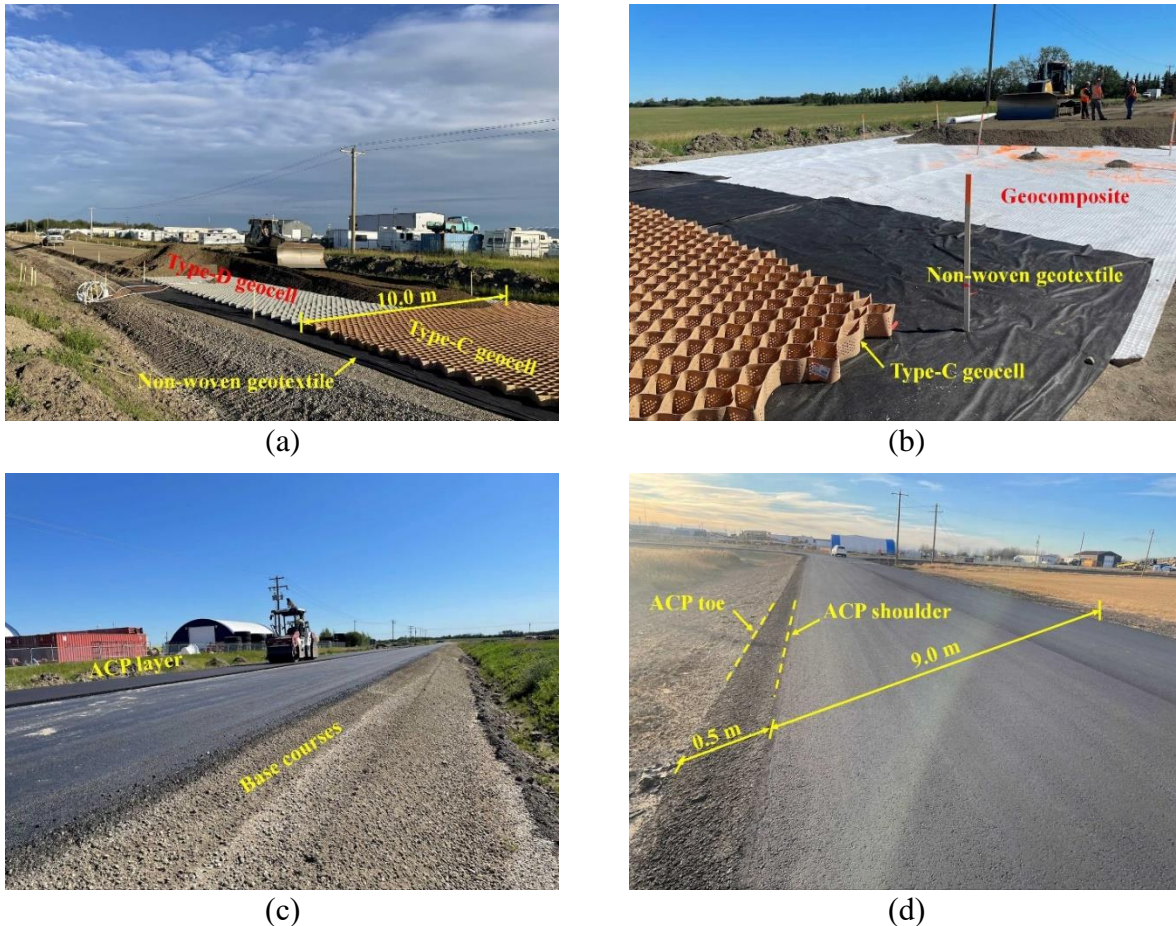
Photographs of pavement construction: (a) and (b) the compaction of base courses in geocell and geocomposite sections, respectively, (c) the asphalt concrete layer, and (d) the finished pavement surface
